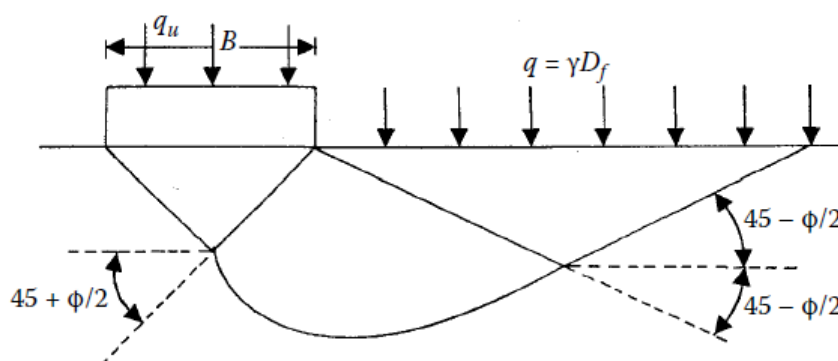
Modified failure surface in soil supporting a shallow foundation at ultimate load (Das 2009).
